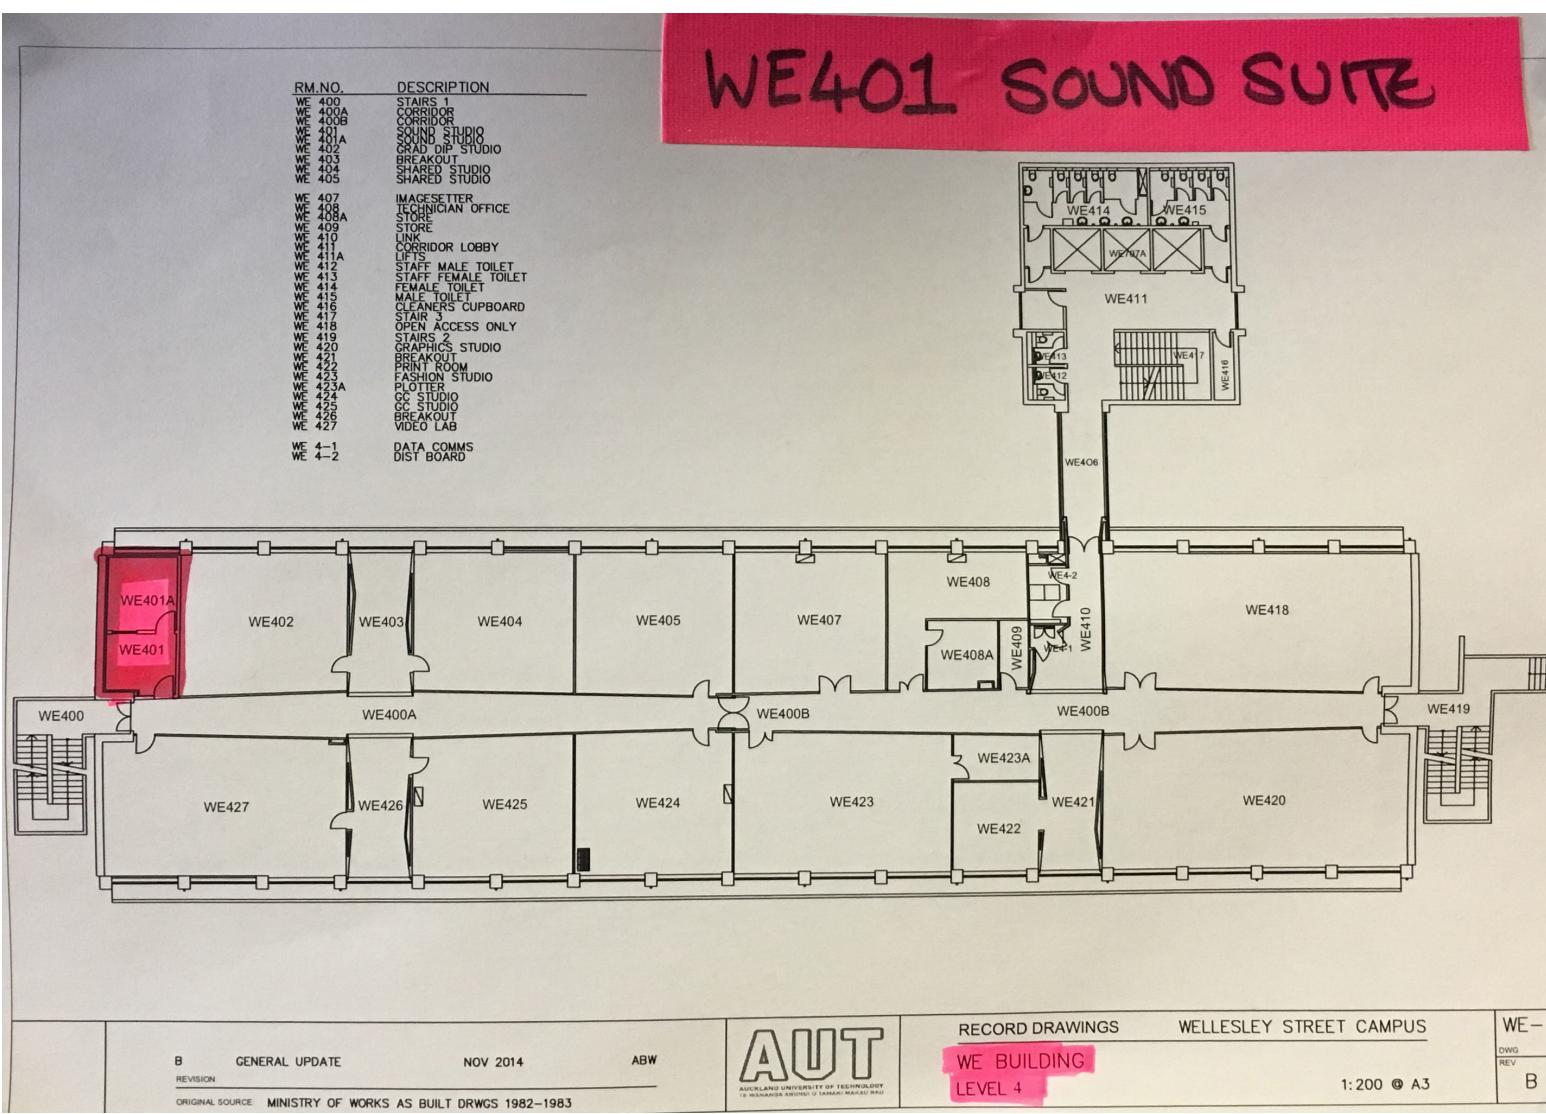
Jonathan Gu (2017). The floor plan for WE building 4th floor
